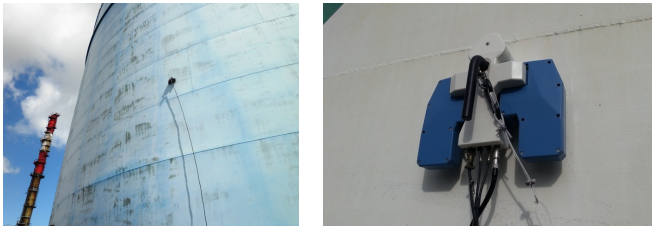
Typical inspection conditions for magnetic crawlers operating on a structure assembled out of welded steel plates [Source: RoboPlanet<sup>3</sup>].
